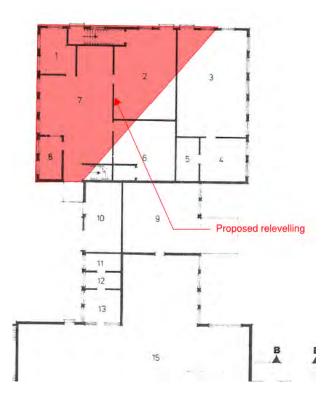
Foundation Plan – Damage Repairs
